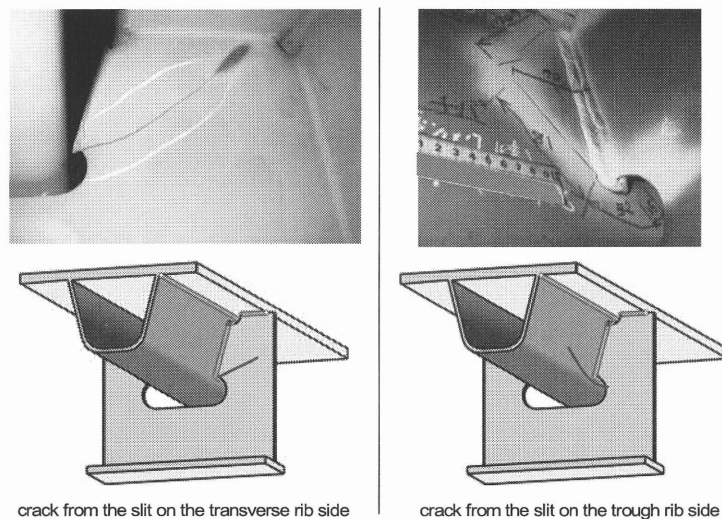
Typical cracks at the connection of transverse rib and trough rib
